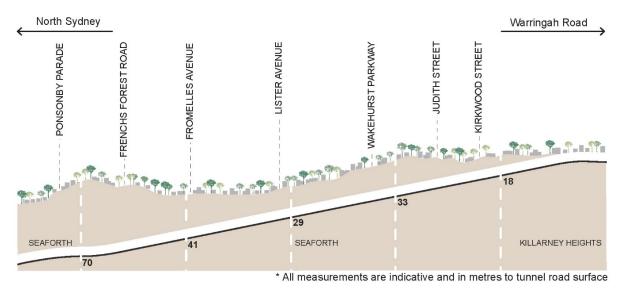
Indicative vertical alignment of the ramp tunnel connection to the Wakehurst Parkway
